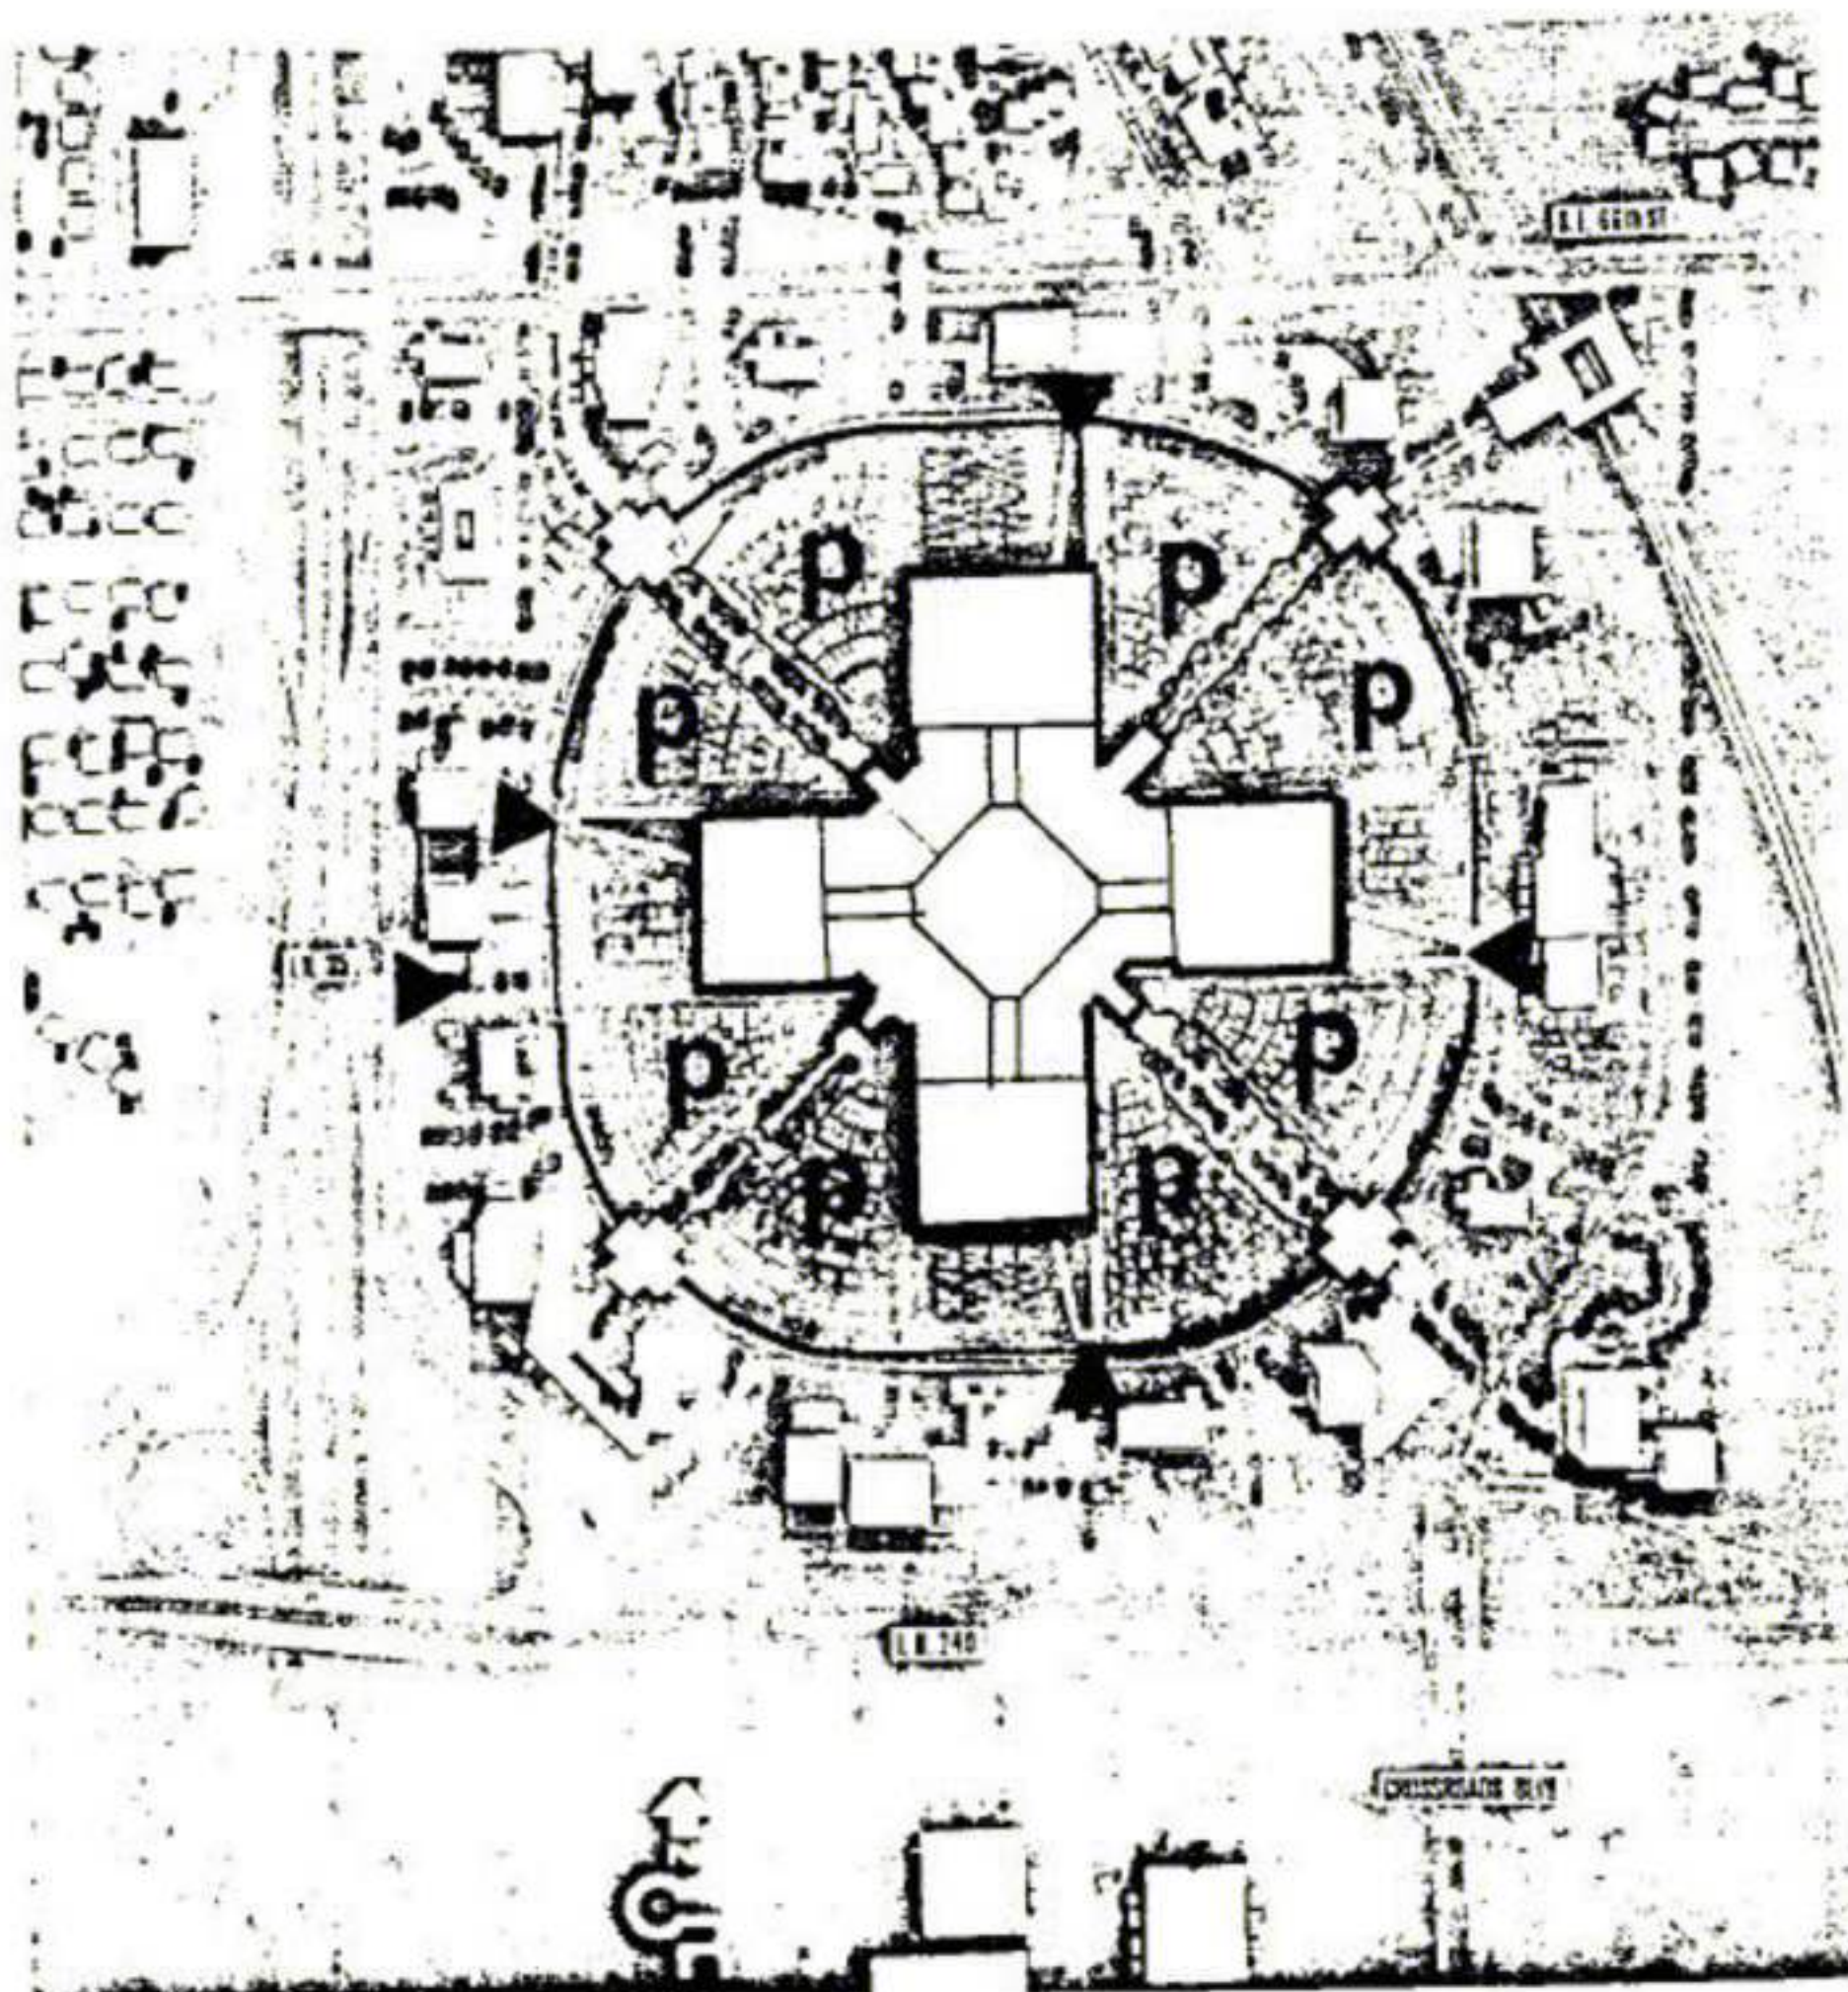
Split Parking Crossroads Center, Oklahoma City Split Parking offers short distances to all four department stores.
